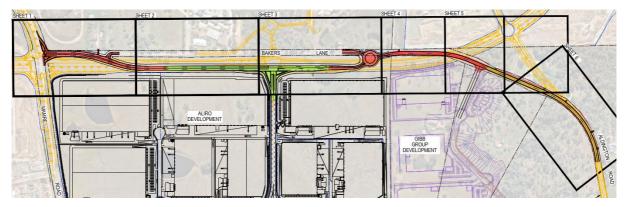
Proposed interim arrangement of Southern Link Road adjacent to the Site
